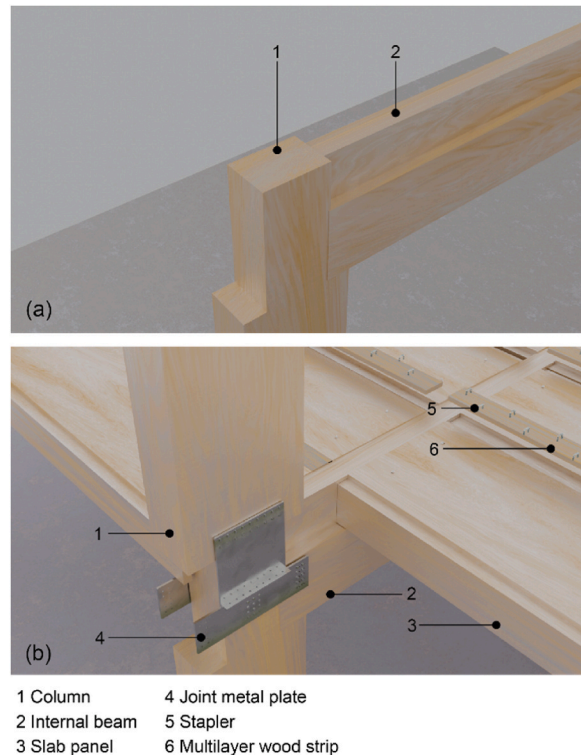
Details of (a) beam-to-column and (b) beam-to-panel connections.
